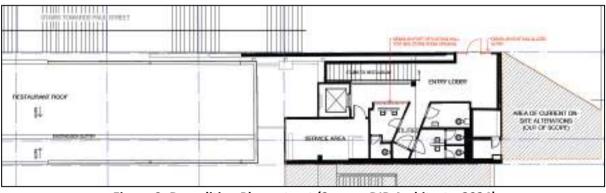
Demolition Plan extract (Source: BJB Architects, 2024)
